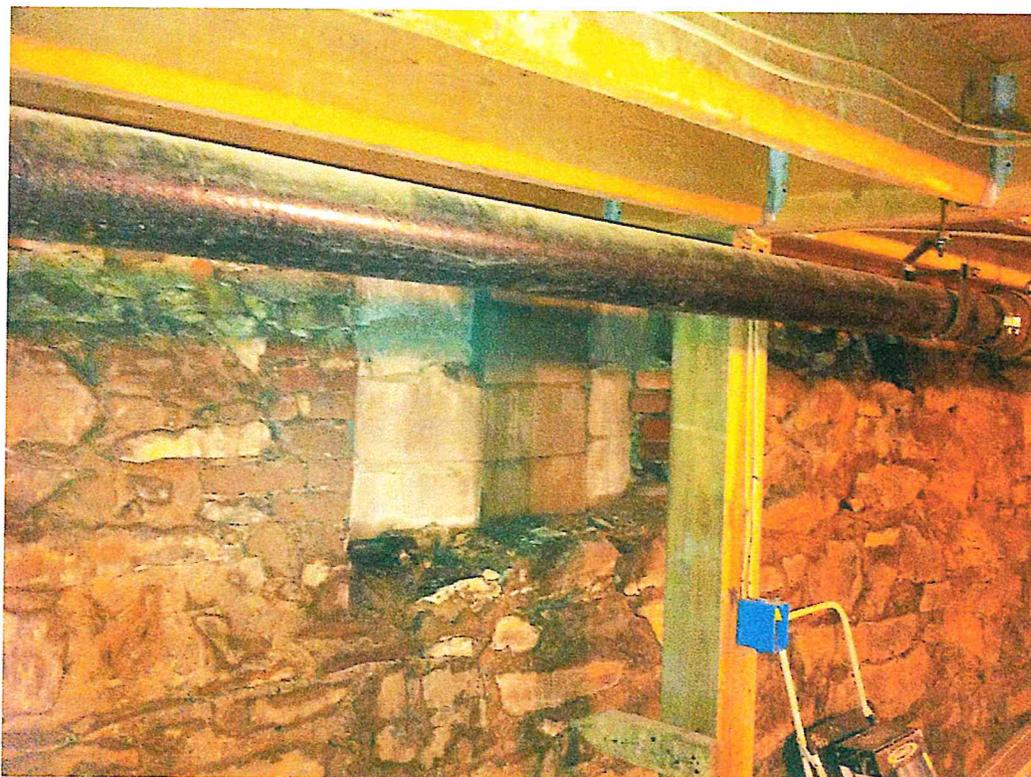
Interior of north wall of cellar showing original stone foundation. Former above ground windows have been filled in. The floor structure supporting the first floor is not original and will be replaced with mill construction techniques matching extant framing of the floors above. Stone walls will remain exposed in the adaptation of this level into a Café.
